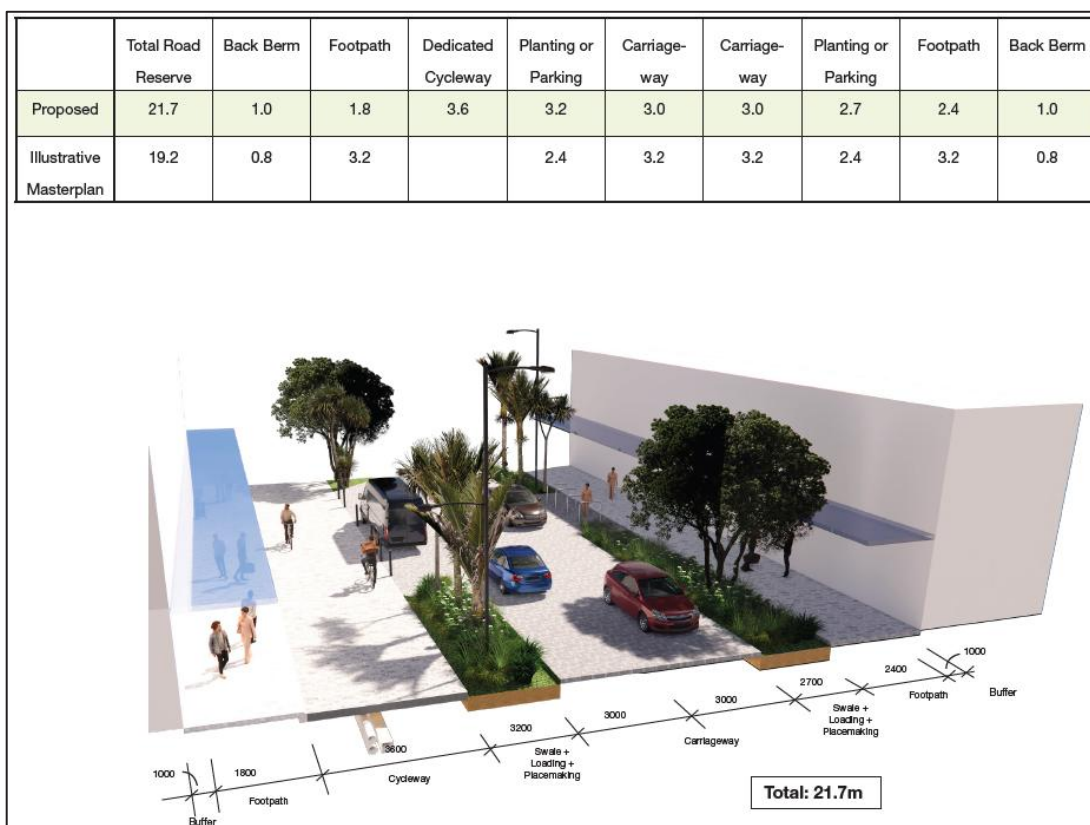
Road design table and illustrative cross-section for Village Centre Secondary Road.
